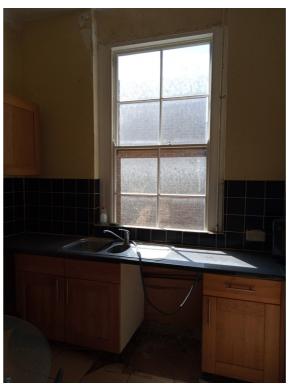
1st Floor rear window to kitchen to be replaced in existing opening
